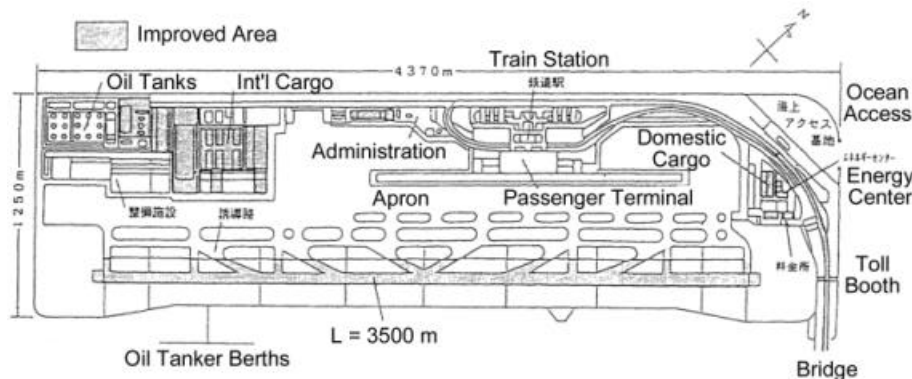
Site layout (Kaiyo Kogyo, 1995)
